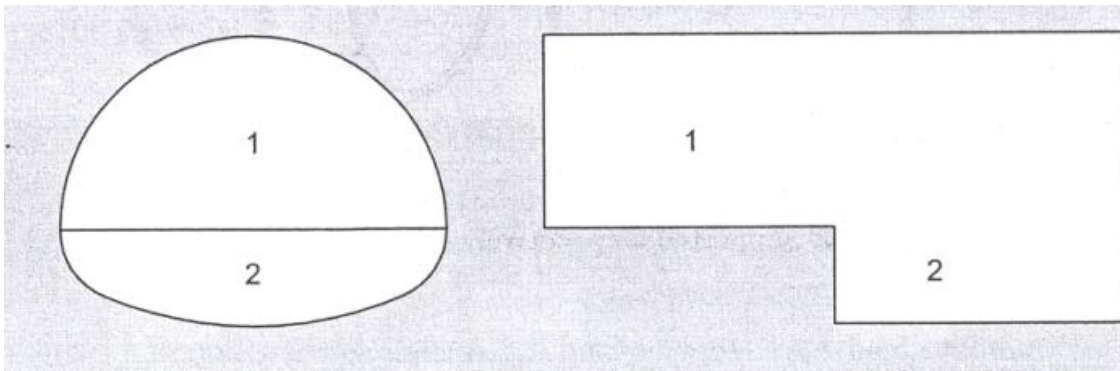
Top heading, cross and longitudinal sections. 1: calotte, 2: bench [1].
